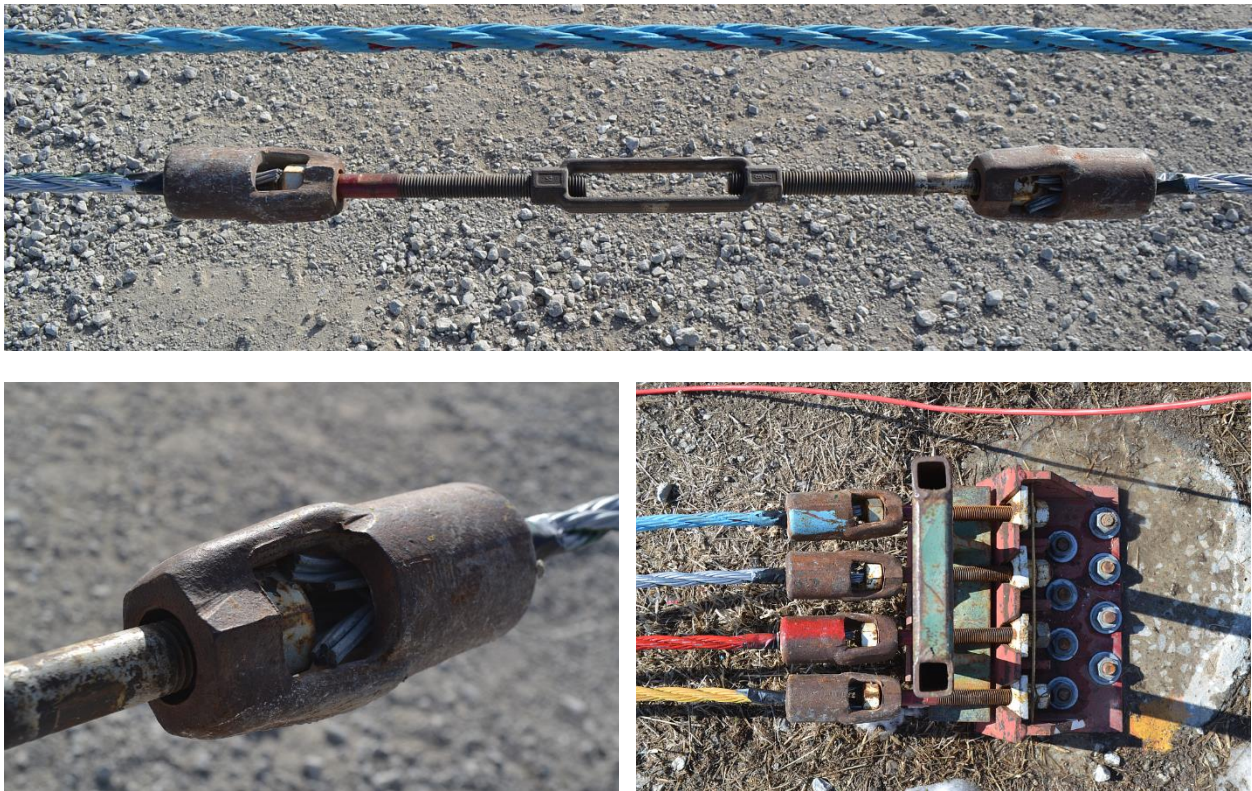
Bennett Bolt Works, Inc. Cable Coupler – Model No. CGBBHT
